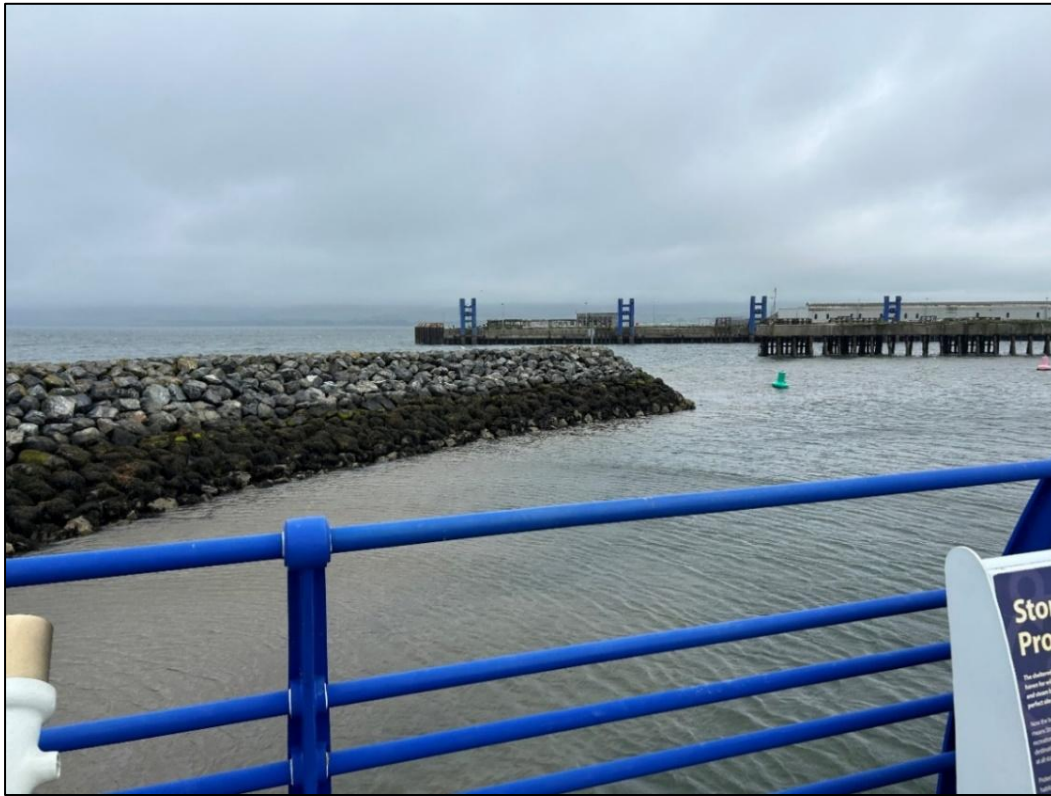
View from Coastal Walkway path towards the beach and existing slip way to the west of the existing Marina
